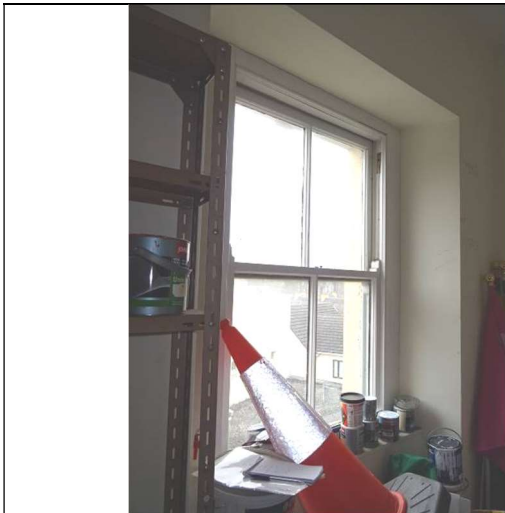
Second floor, storeroom to east of primary stairs, window to north elevation
